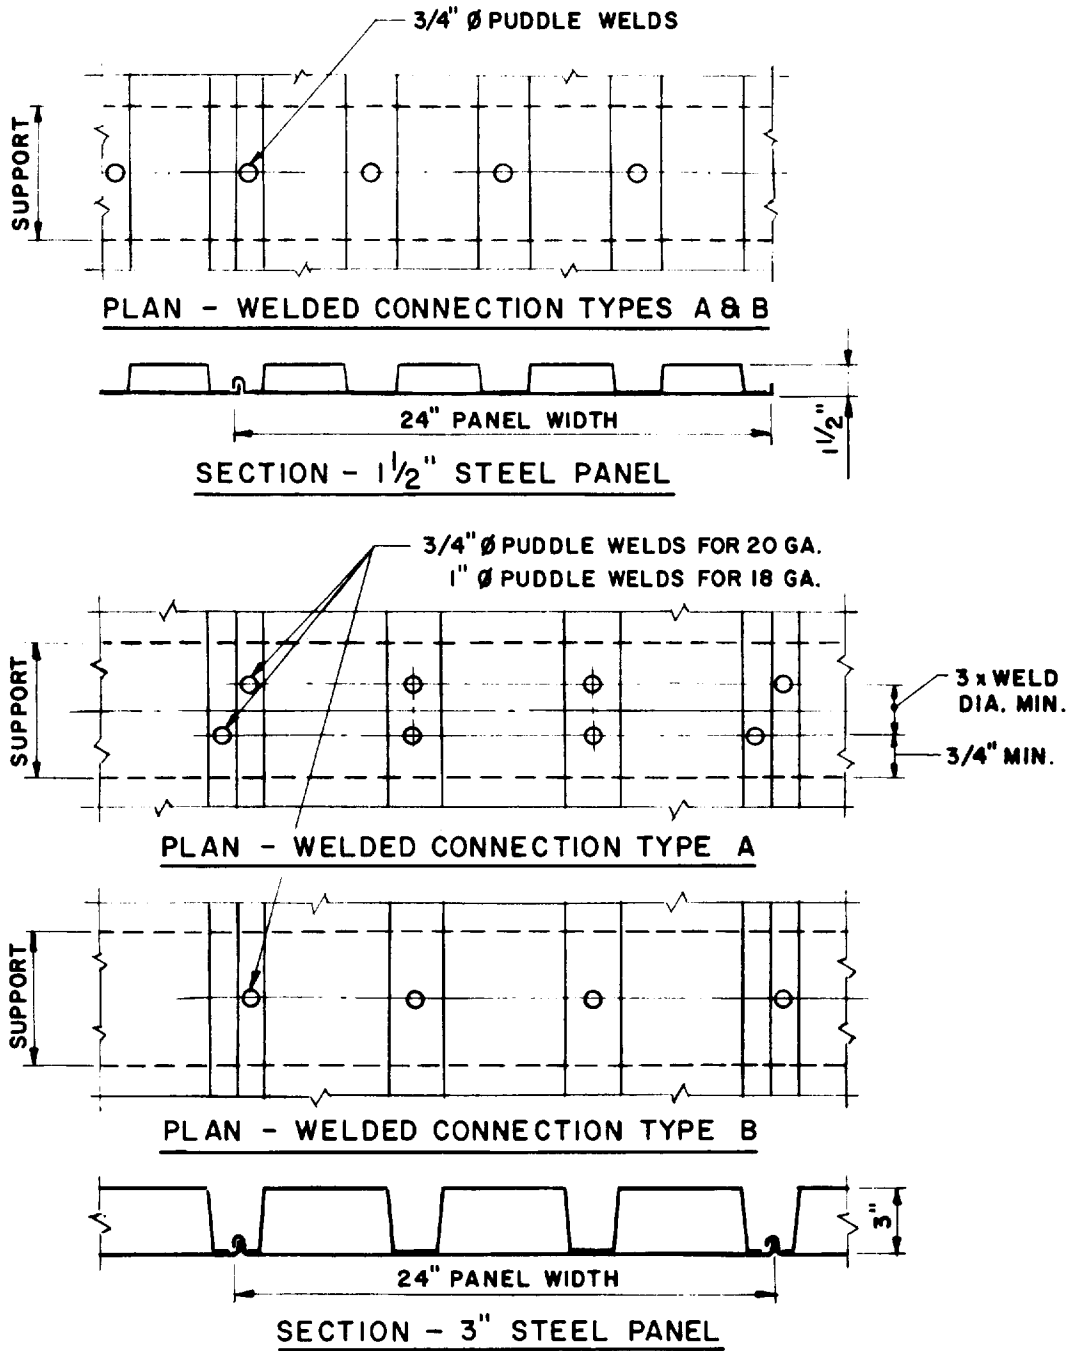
Typical welded connections for attaching cold-formed steel panels to supporting members
